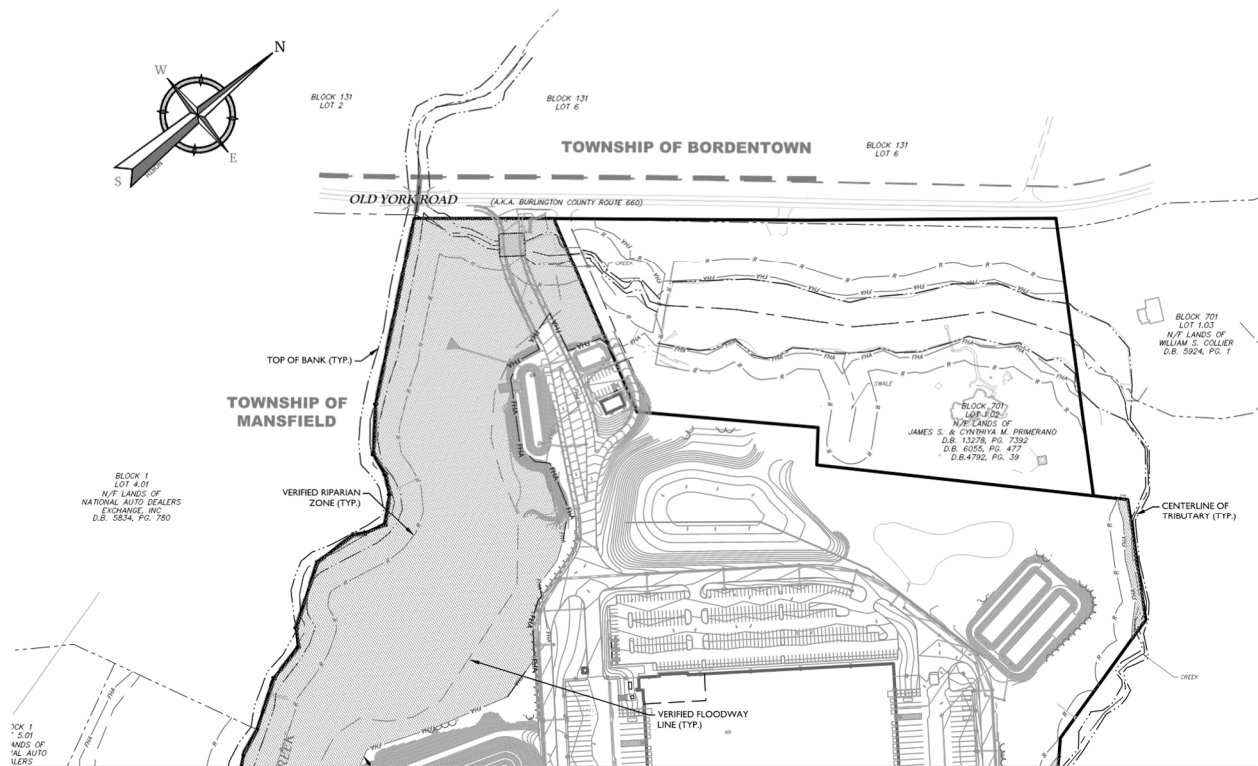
Excerpt from "Overall Proposed NJFHA Plan", sheet 1 of 6, dated 6/9/22, prepare by Colliers Engineering & Design
